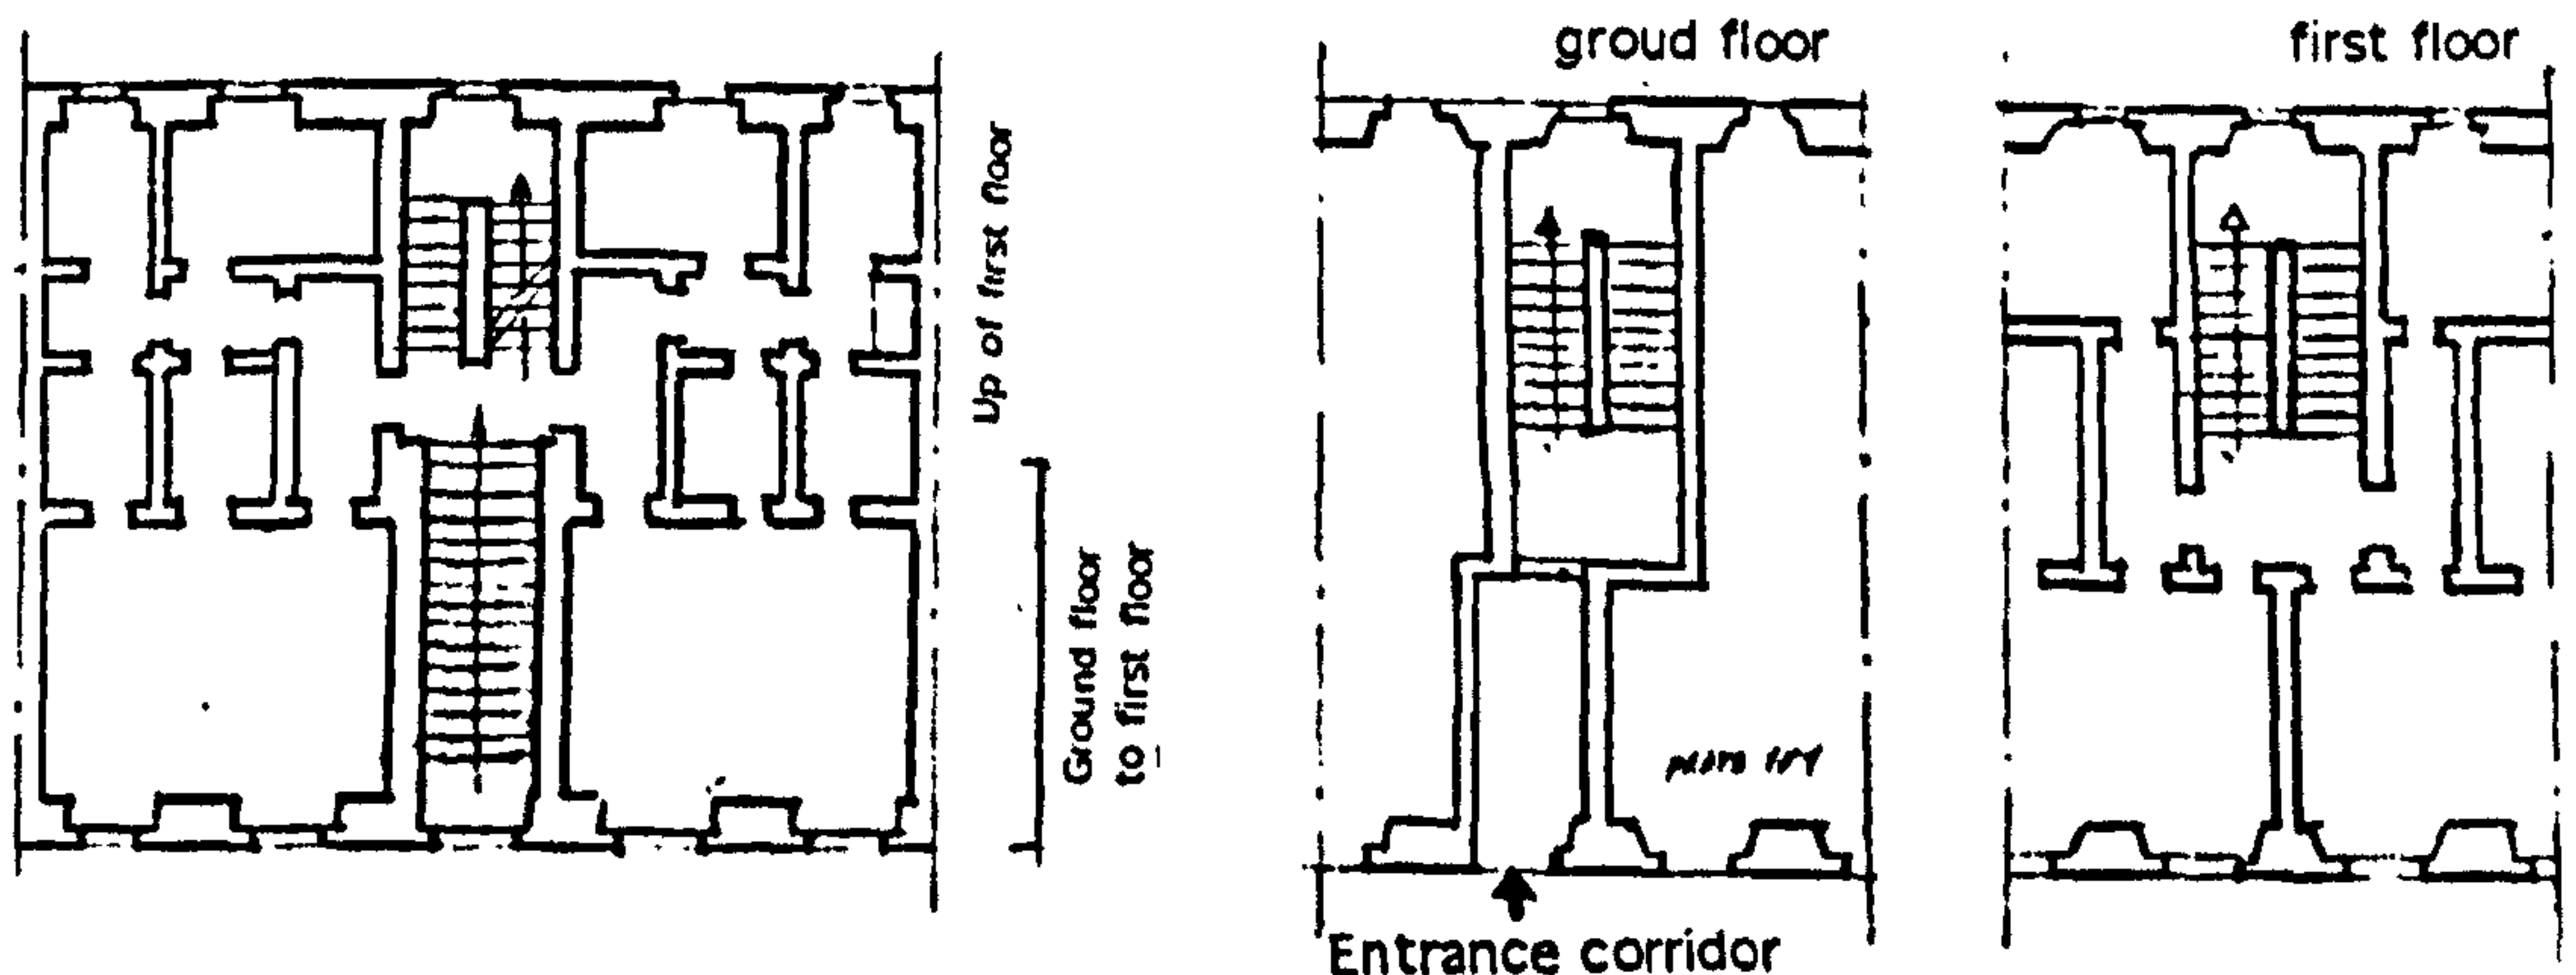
Sol. 1, example of position of stairs on ground and first floor
